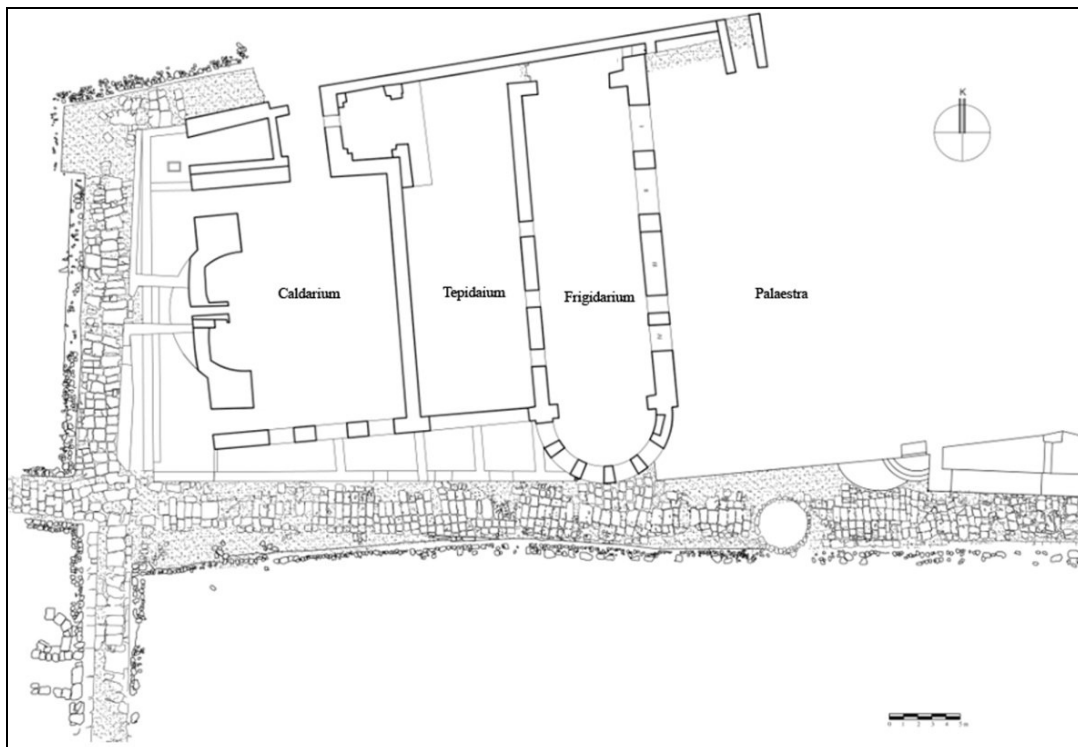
Structural plan and furnishing plan obtained from balloon photogrammetry.
